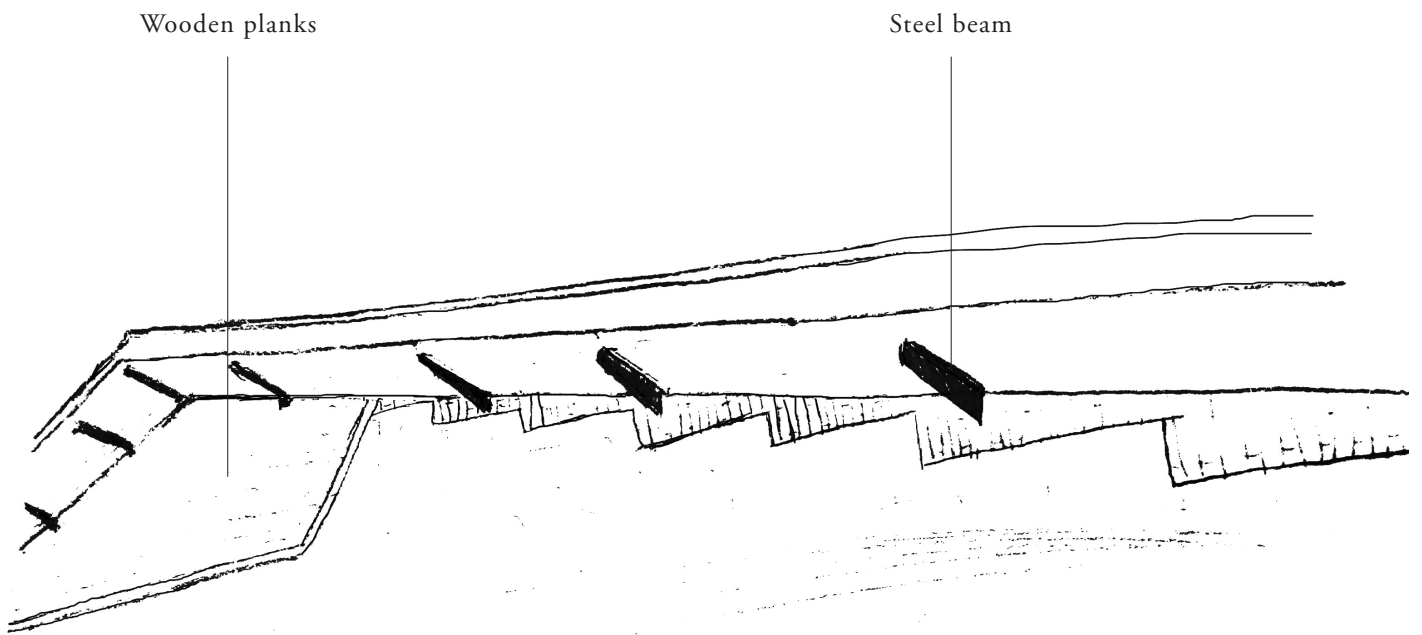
Sketch of the fascia with steel beams sticking out of the wall
